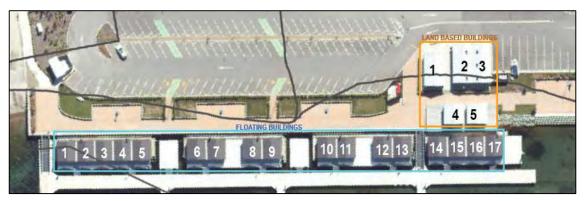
Constructed layout of floating buildings (within blue outline) and land-based buildings (within orange outline)
